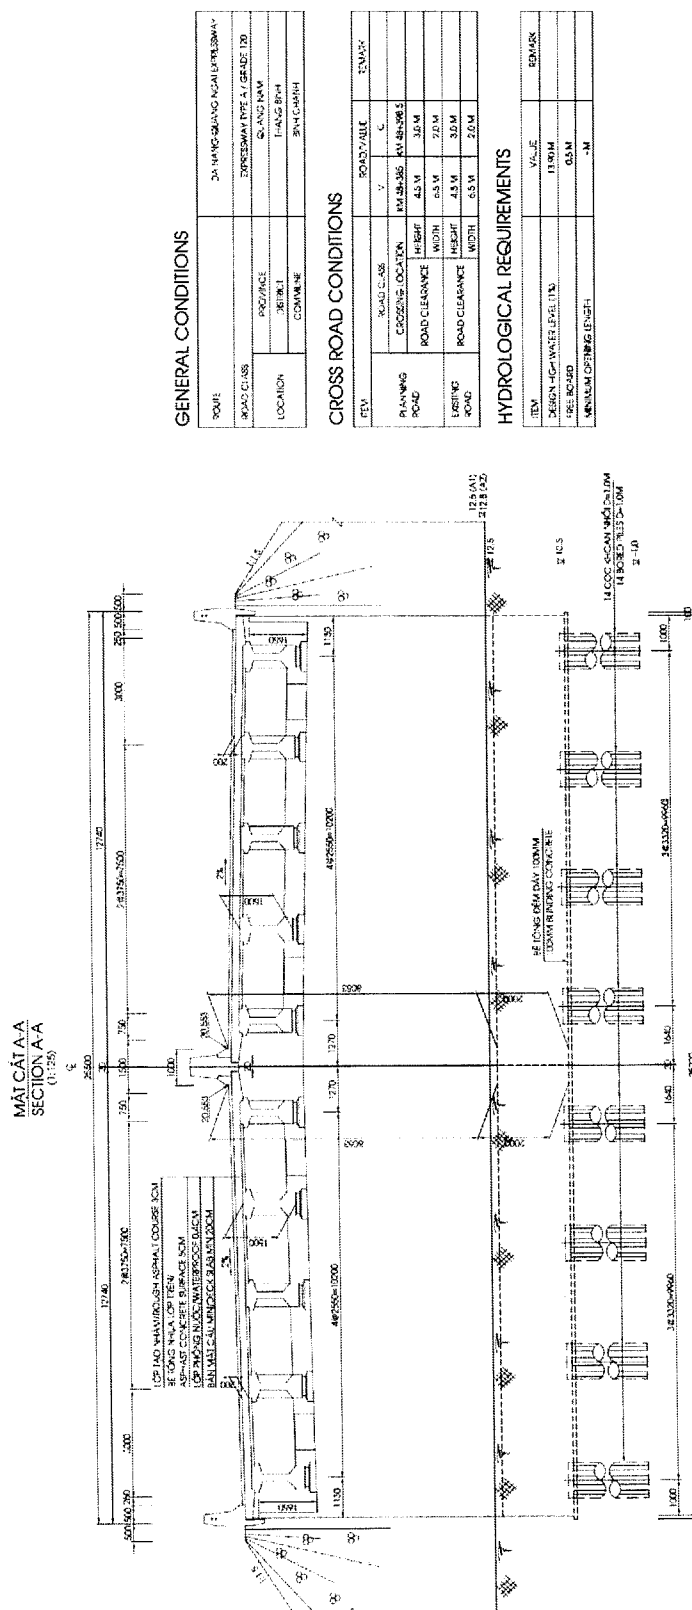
Bridge Cross Sections (LRB09, 2/2)
